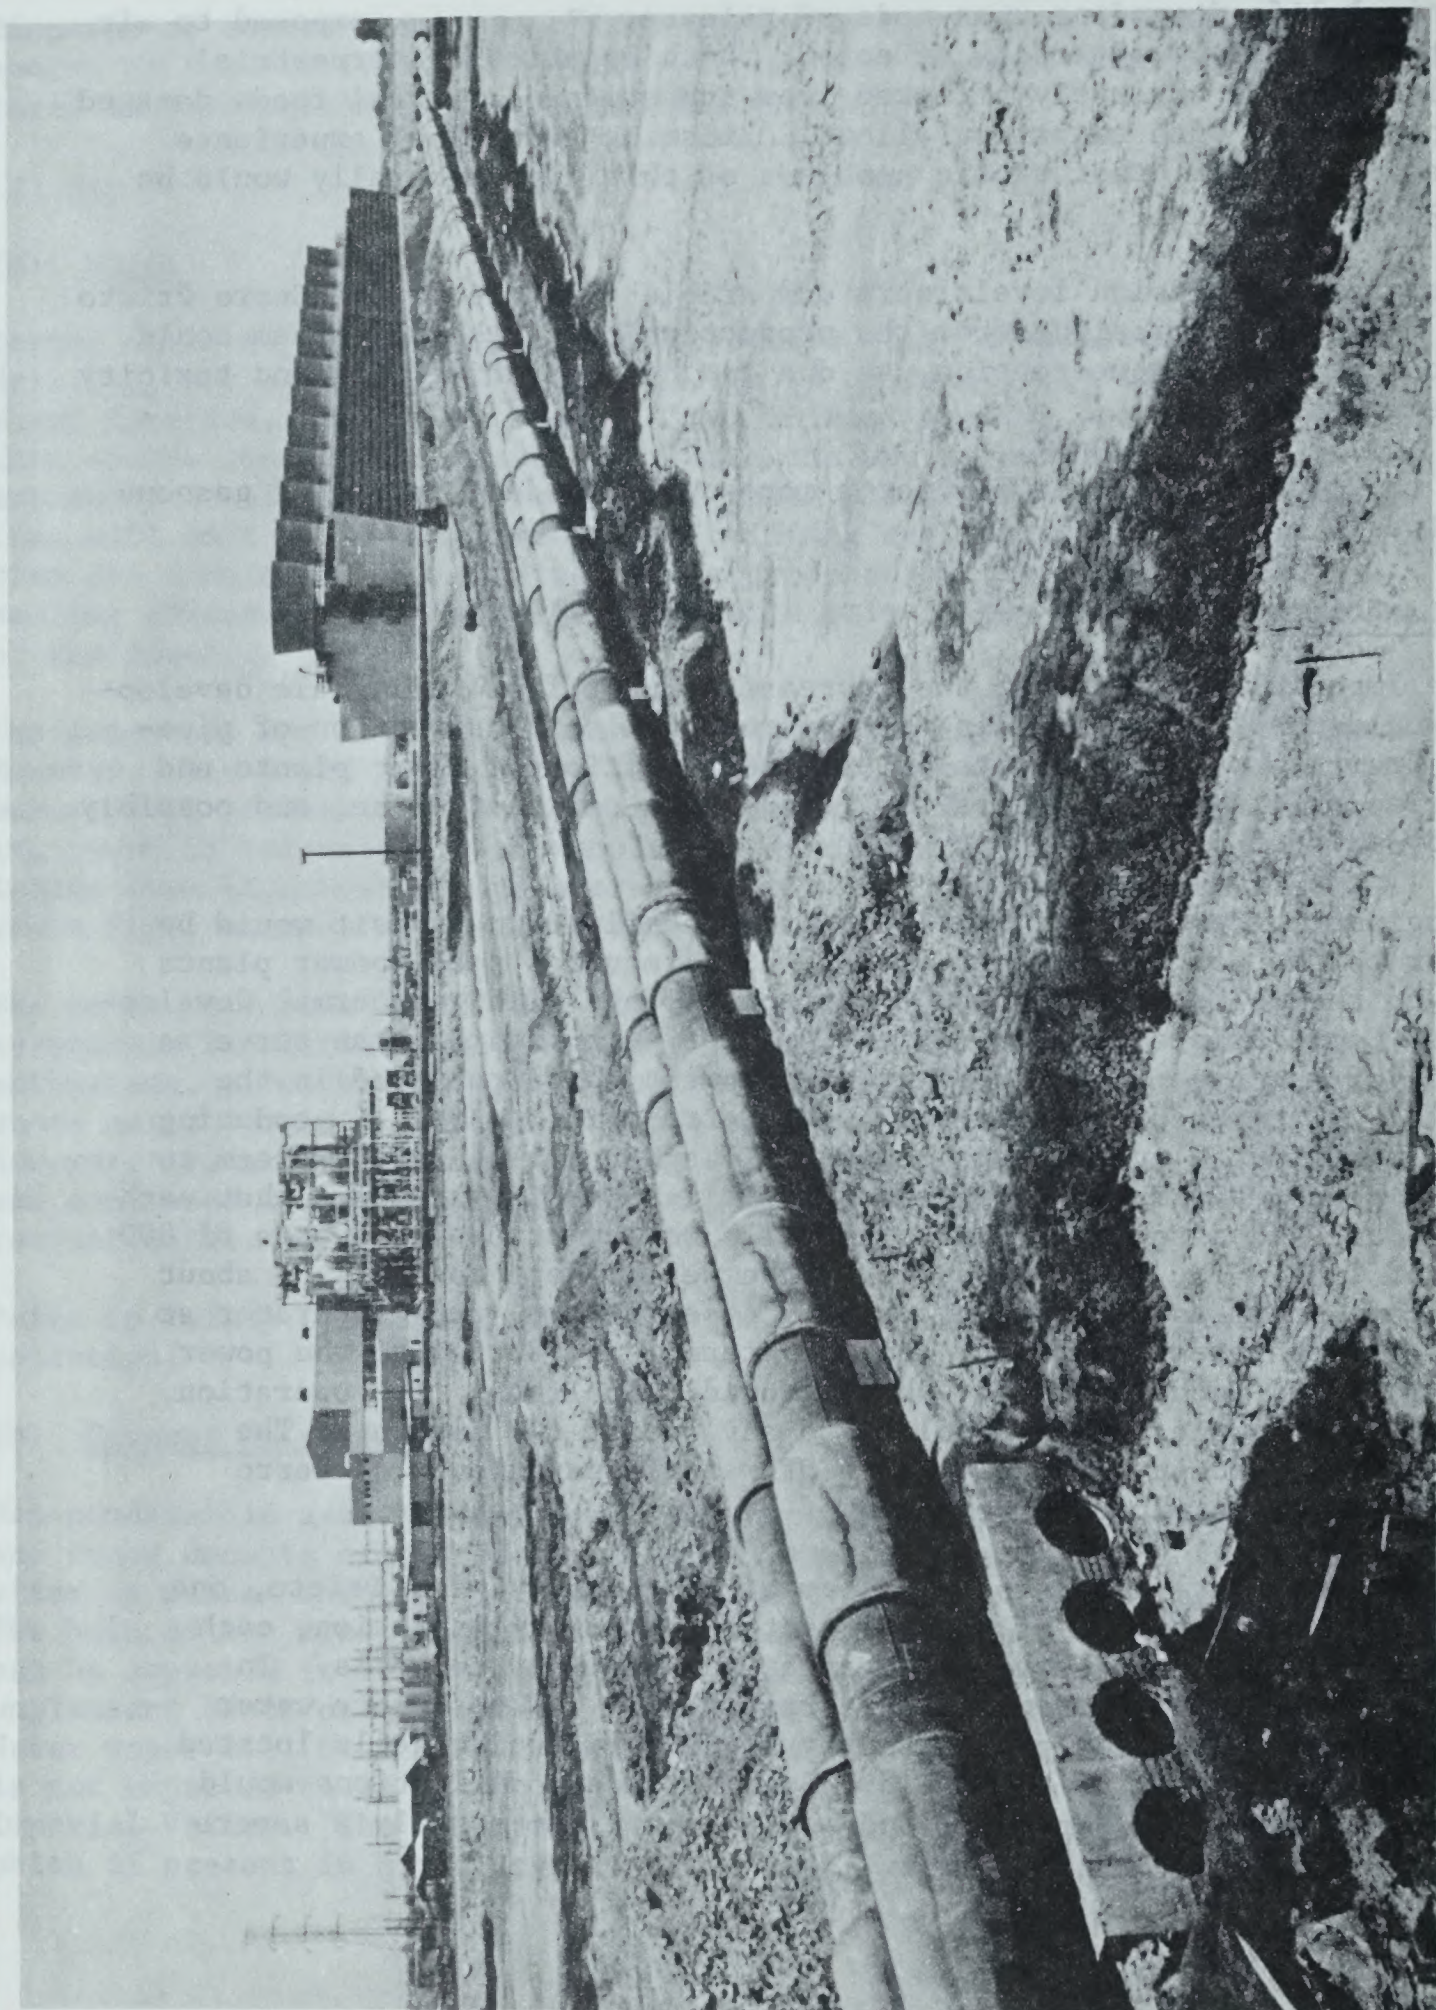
Cerro Prieto, Mexico. 75 Megawatt power plant (left) and cooling towers (right). Steam lines from wells in foreground.
